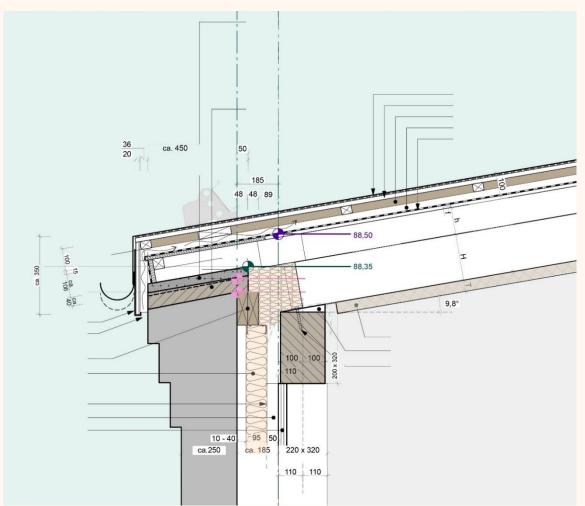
Detail of the H-building wall-roof connection. The technical solutions of the installation of the new roof, the connection between the new roof and the existing façade, and the new added internal insulation layer are shown. Original image by KONTUR and SPINN Arkitekter, edited by Jesus Daniel Garcia Melo (NTNU).
